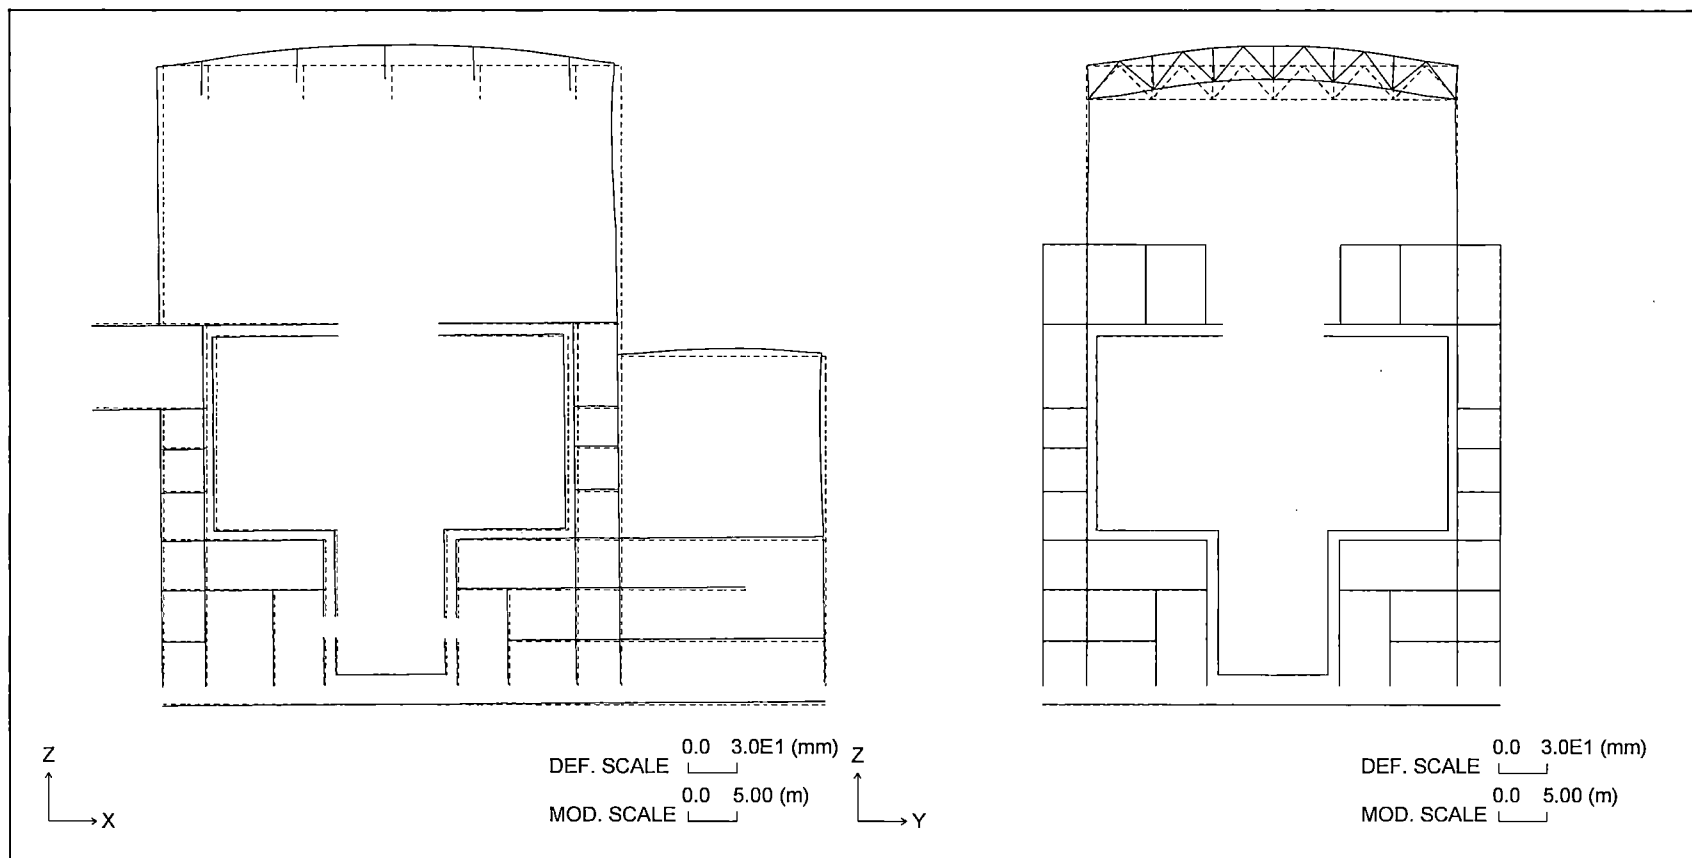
Section Deformation for Tornado Load (South Wind)
